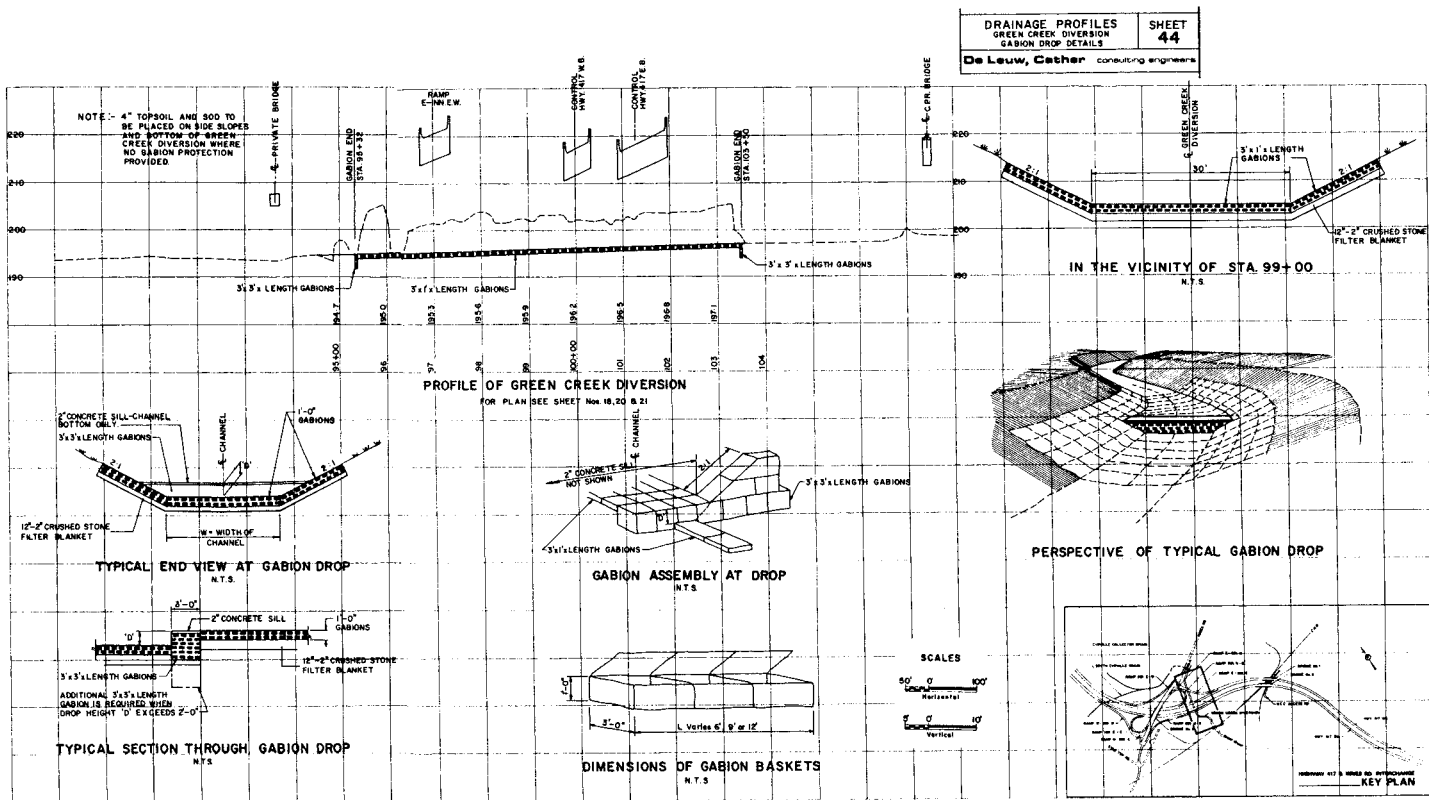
Details of Green Creek diversion channel, showing Gabion basket details, channel cross section, and profile. See Figure 12.8 for horizontal alignment.
